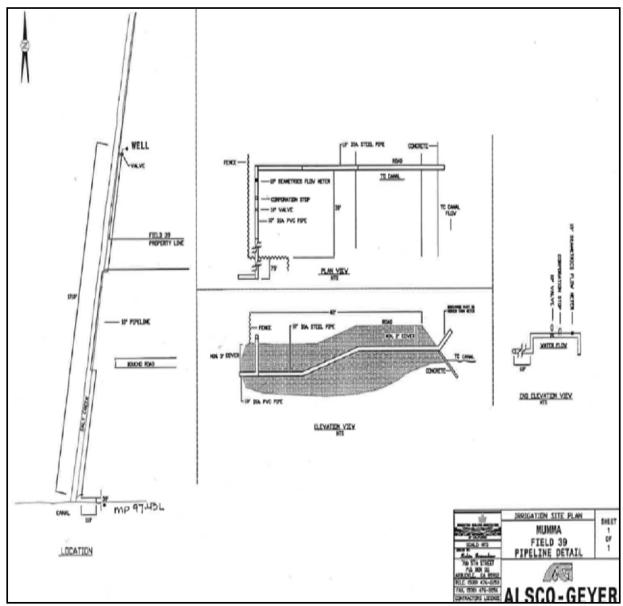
Cross-sectional view showing pipeline placement and elevations.
